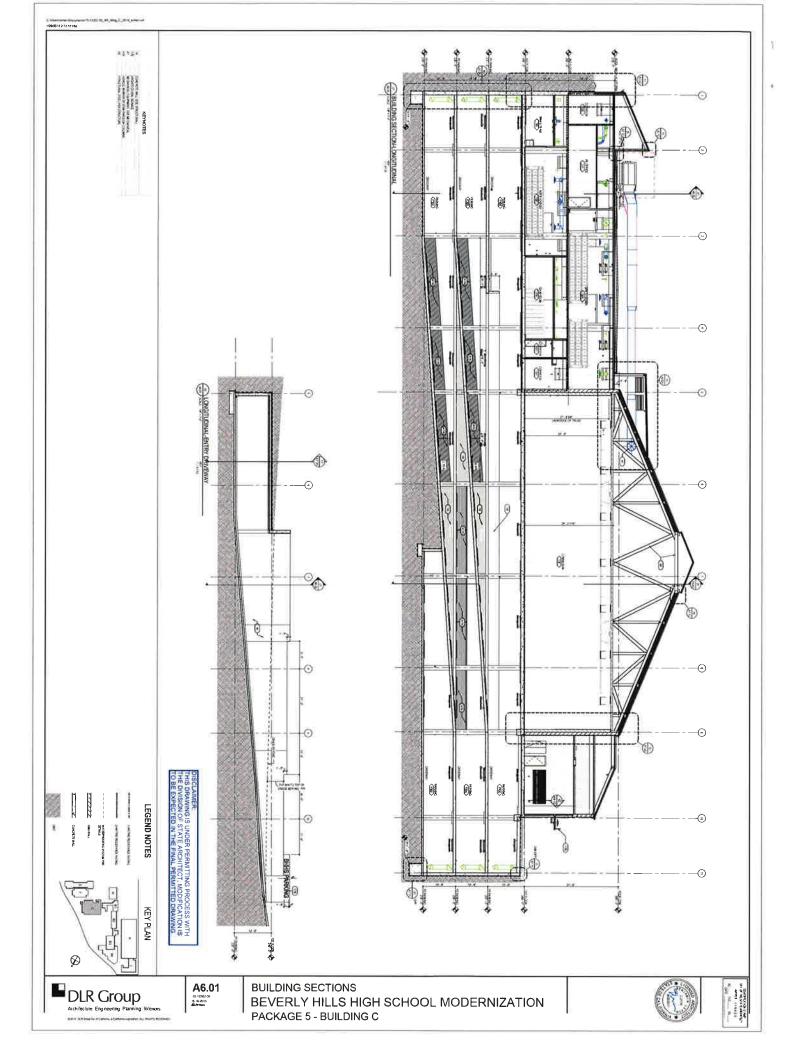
B2 - BHUSD MODERNIZATION PLAN
